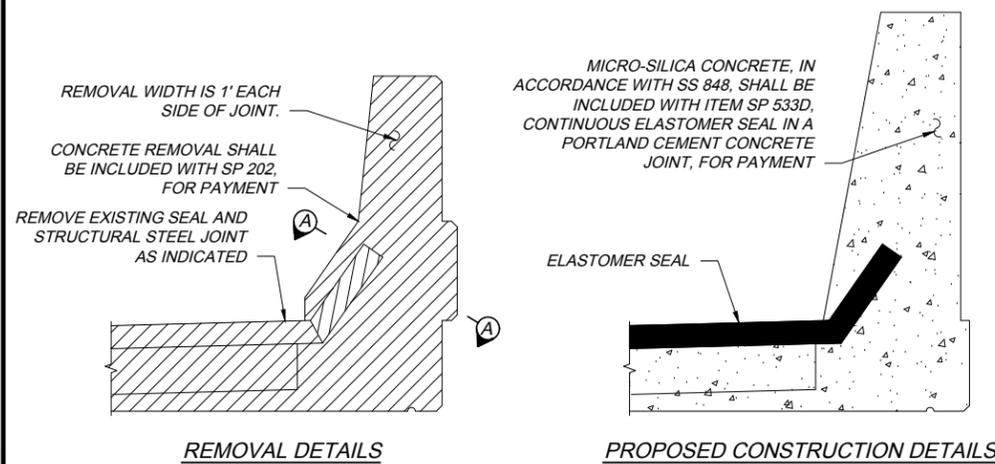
DETAIL AT ABUTMENT - EXISTING STRIP SEAL
